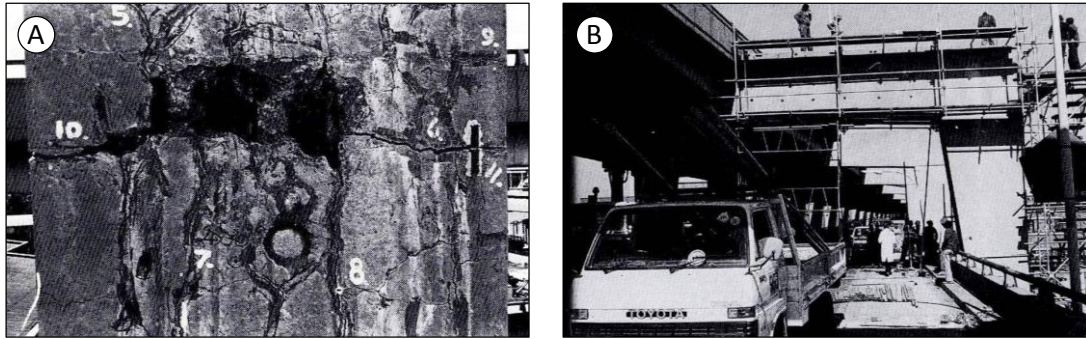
Two-Level Portal Frame (A) Surface Cracking at Beam-to-Column Joint (B) View of Site During Load Test (Blight 1989)
